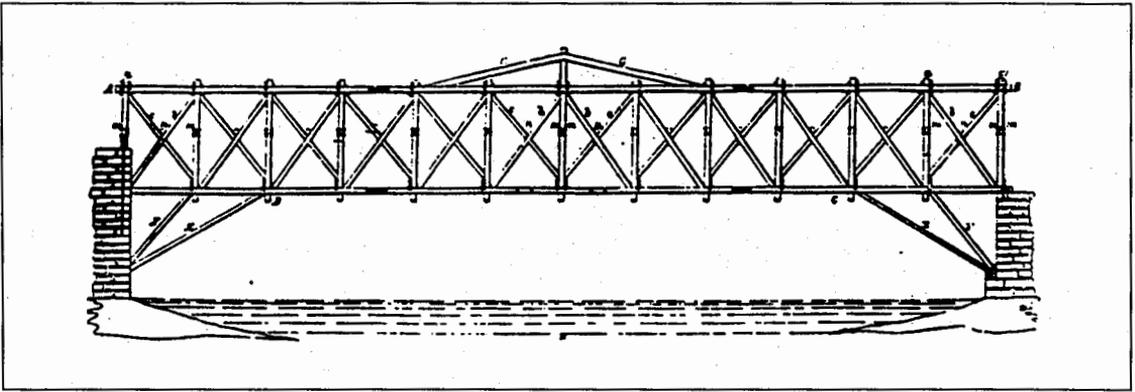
The "new" Long truss, replacing the Pratt (rectangular) and Howe trusses.
